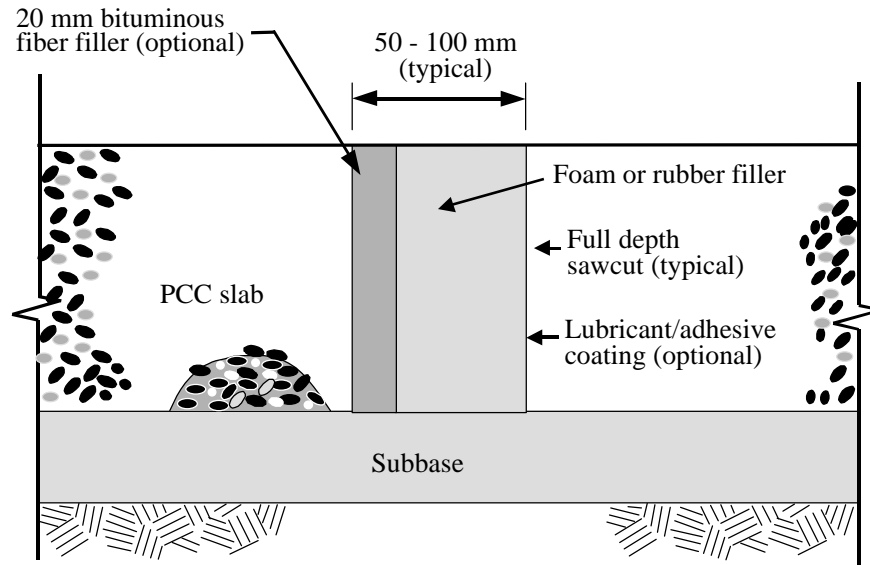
Cross-section of typical narrow pressure relief joint.⁽²⁾
